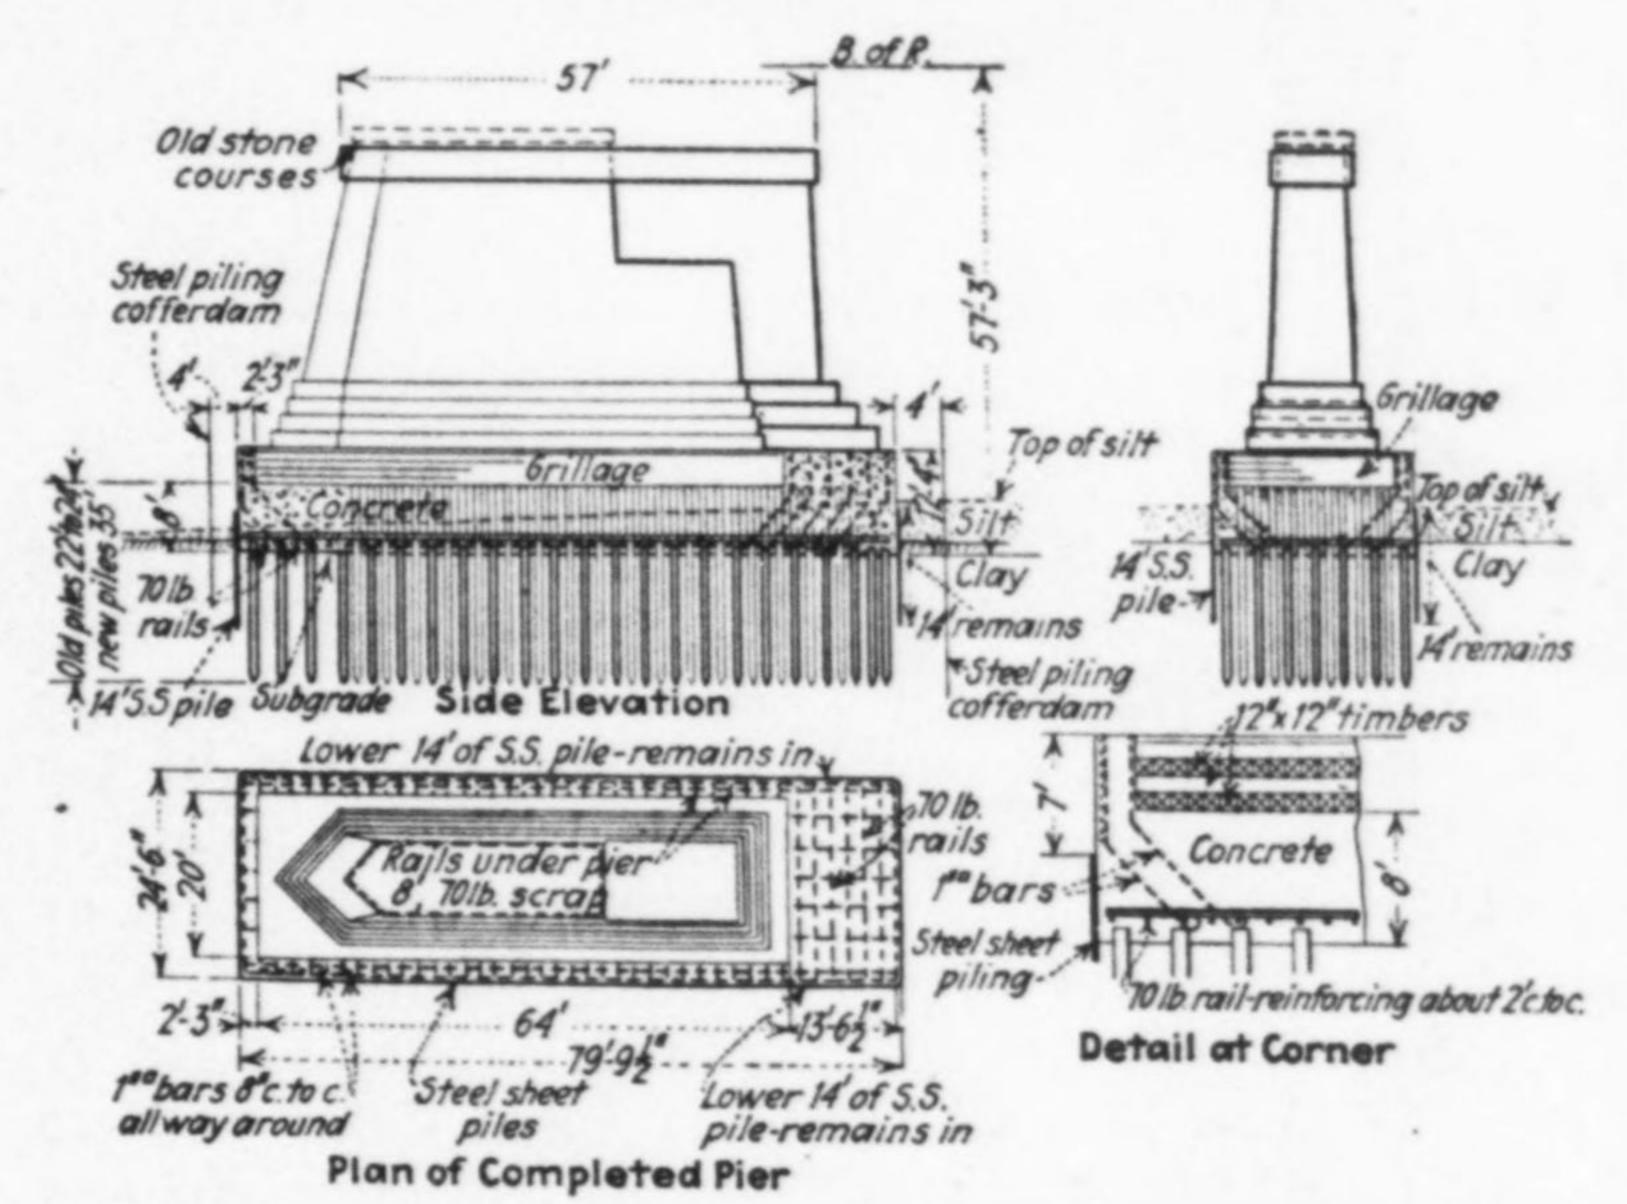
PIER NO. 6, TYPICAL OF OTHER PIERS
